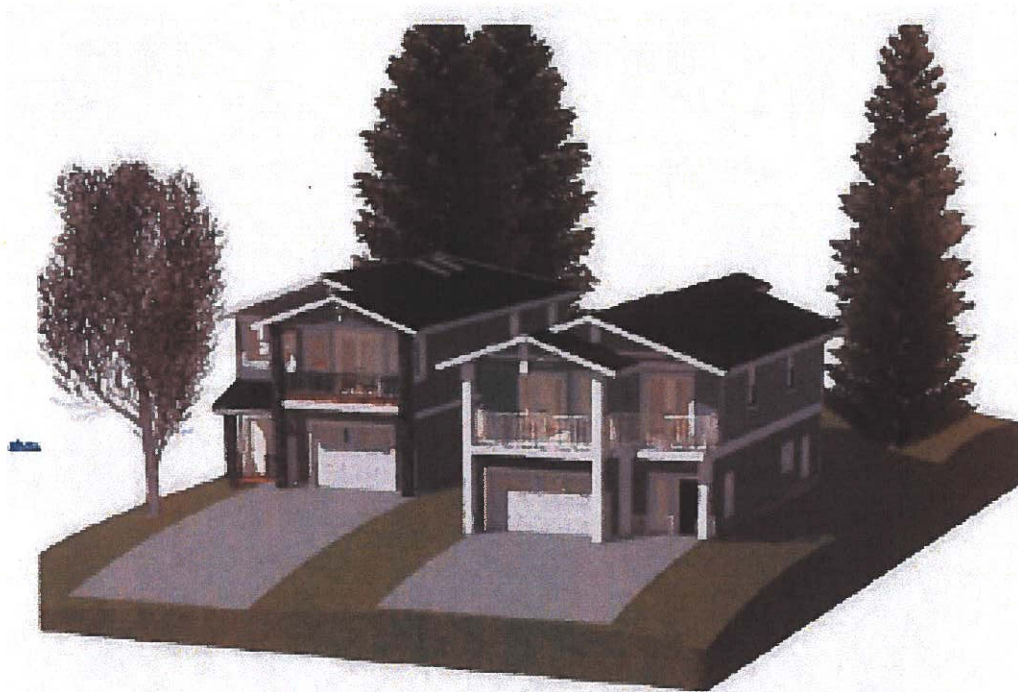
Proposed Perspective View from Canterbury Road (from plans by Jerry Vander Wal)
